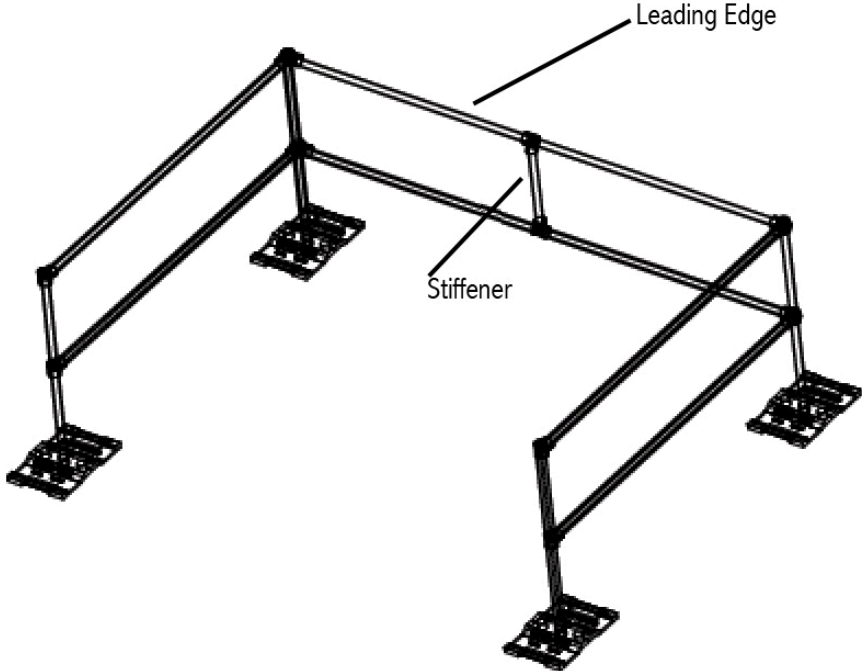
Diagram Showing 6-ft Returns, 9-ft Leading Edge and Stiffeners
